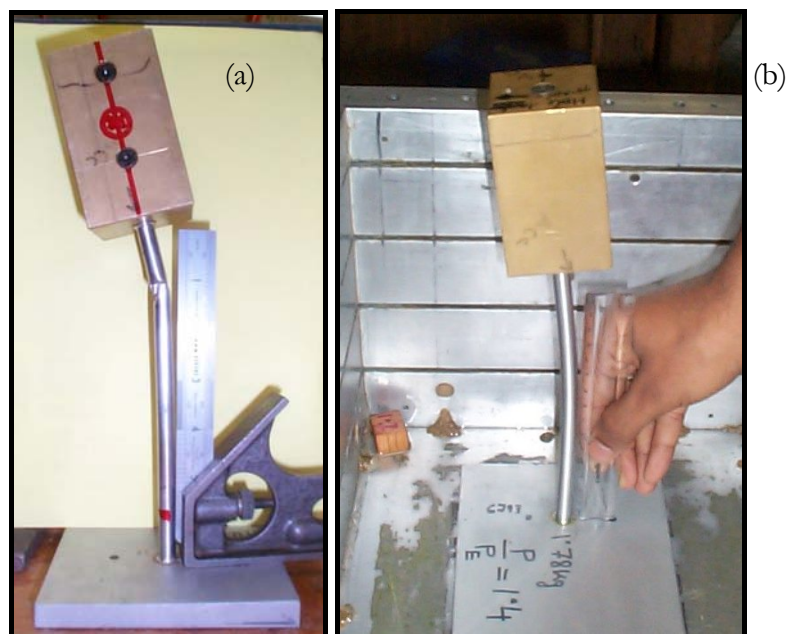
(a): Mode of failure of pile 8 in test SB-04; (b): Mode of failure of the same pile in test SB-05.
